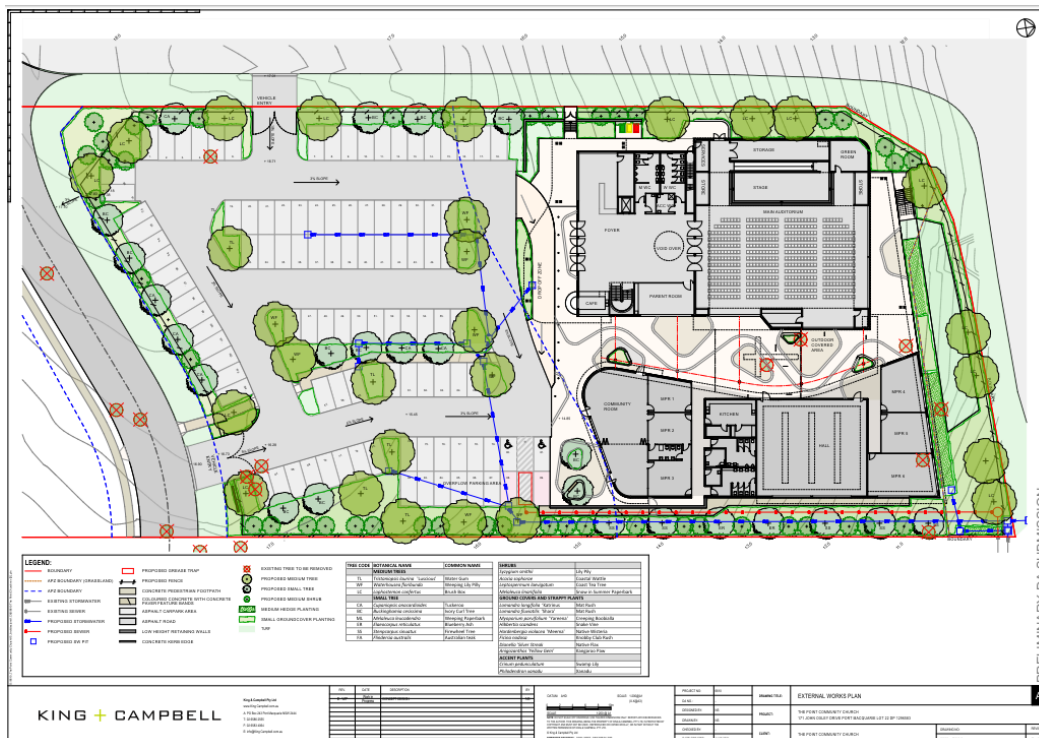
Extract of external works plan showing car park layout and access from car park to the buildings
